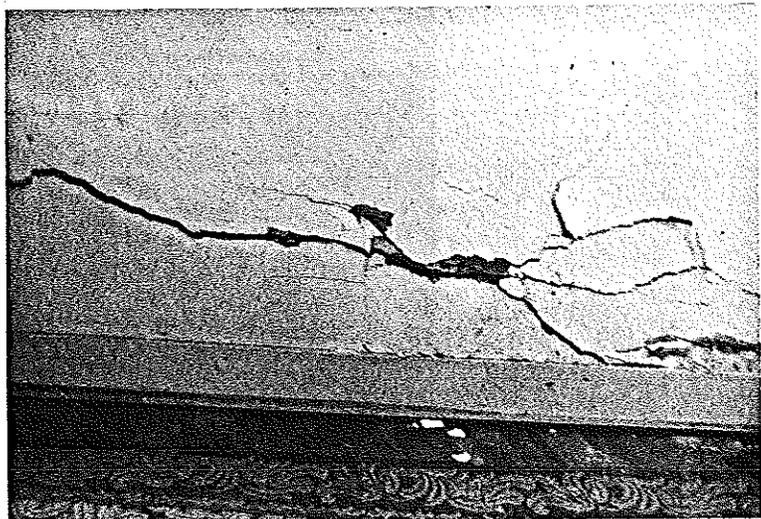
Reopened diagonal cracks on the interior wall of a stone house.
